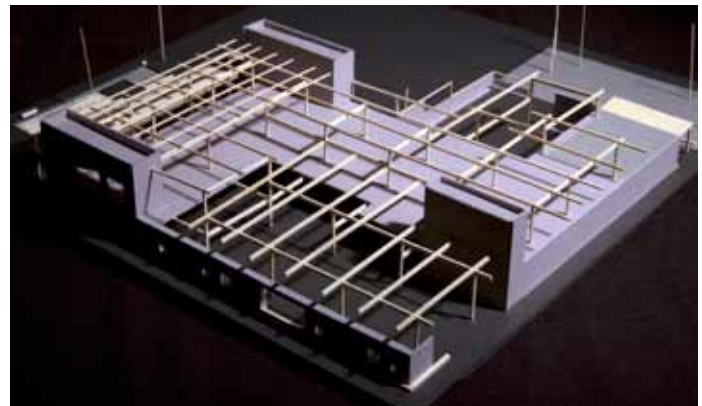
Bird's-eye view looking southeast showing structure (Collin Janke).
